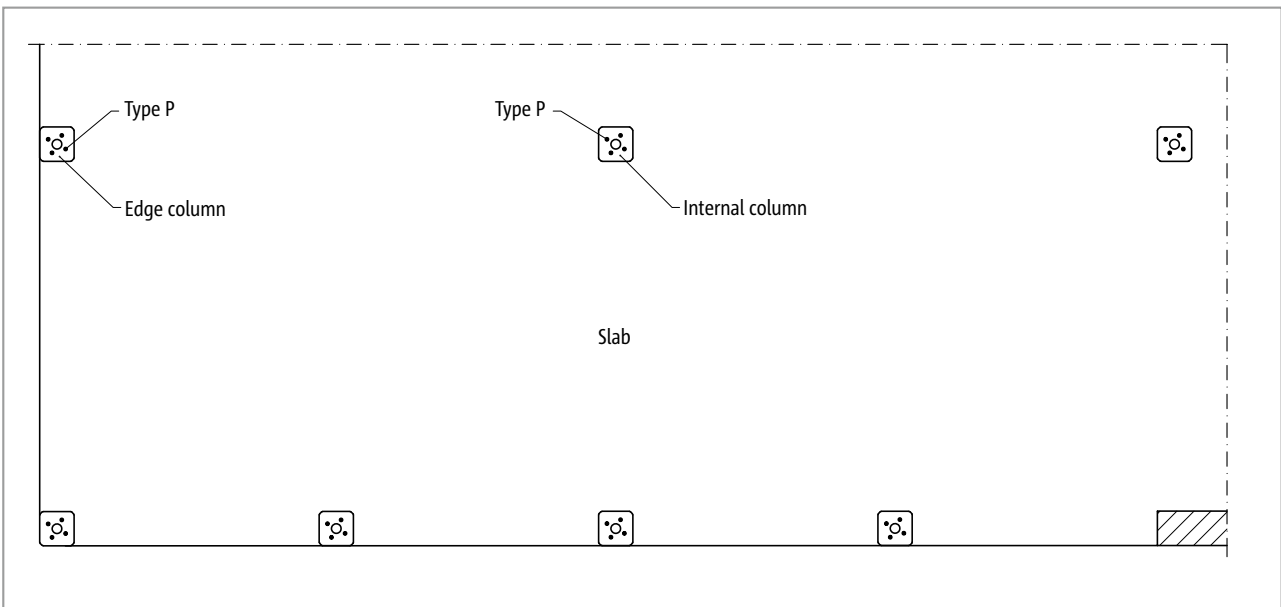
Schöck Sconnex® type P: Element arrangement in the floor plan
